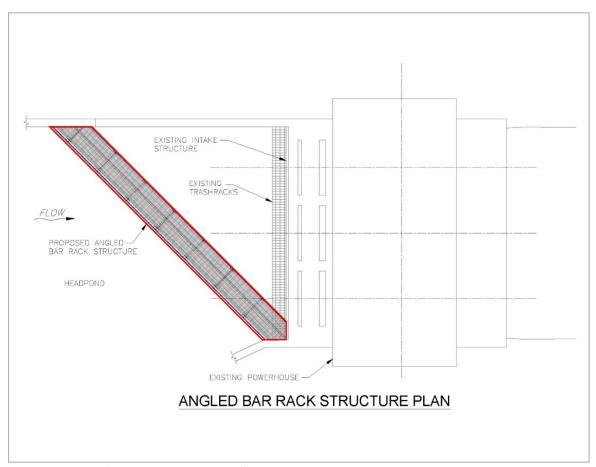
ANGLED BAR RACK STRUCTURE - PLAN VIEW
